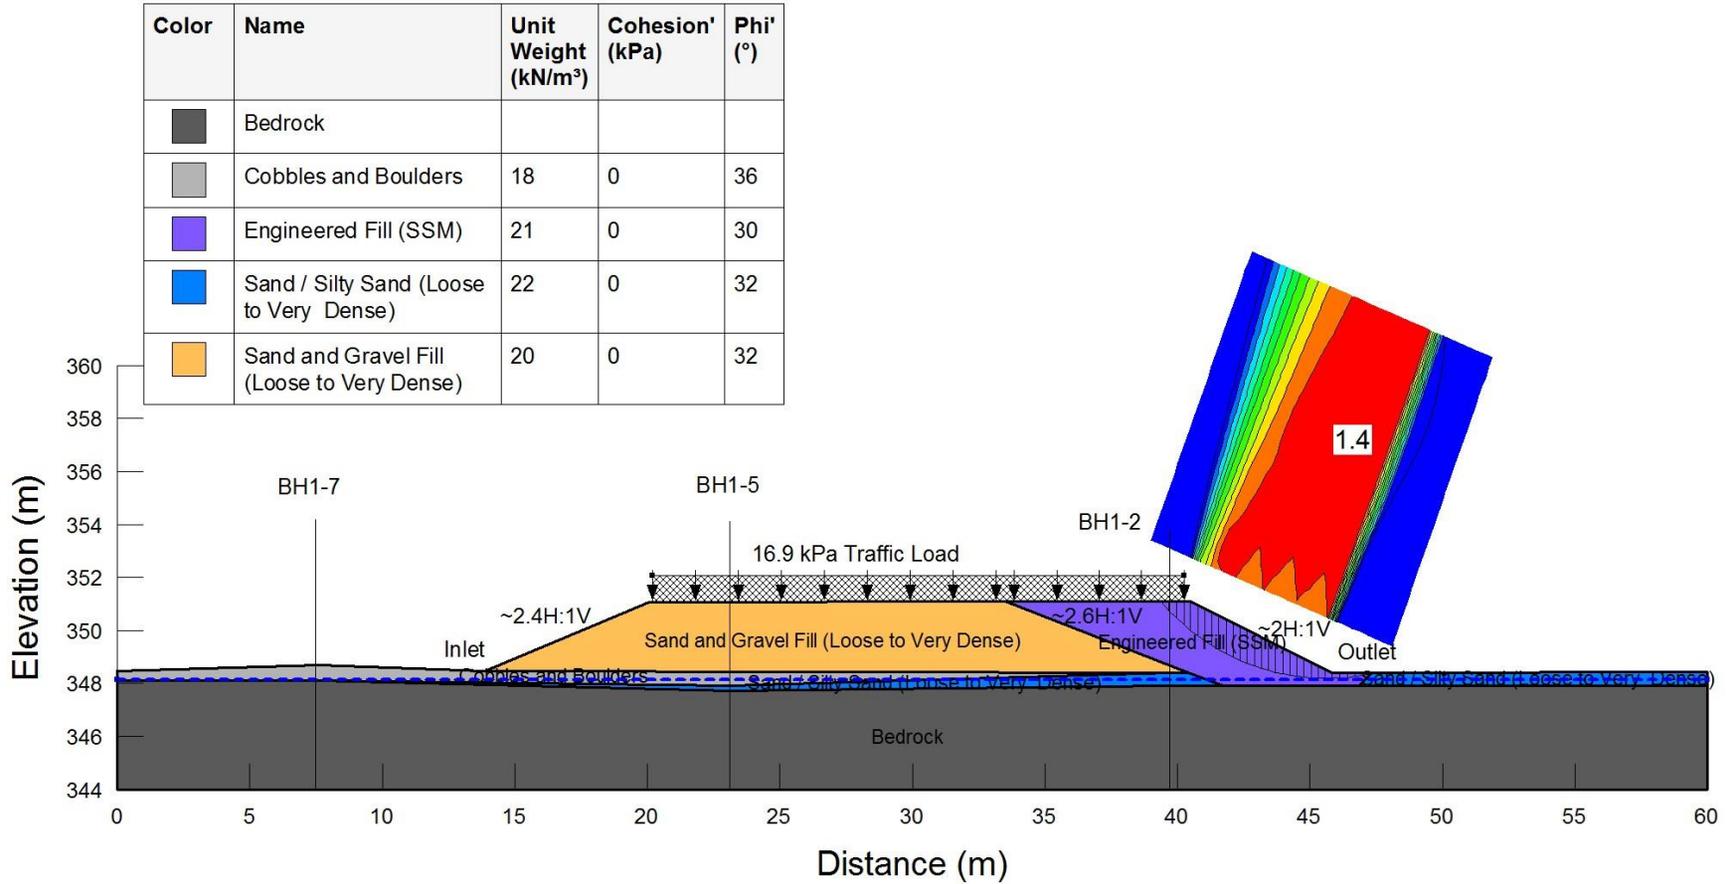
Slope stability analysis for new east (outlet) side of embankment (2H:1V) – drained, static condition
